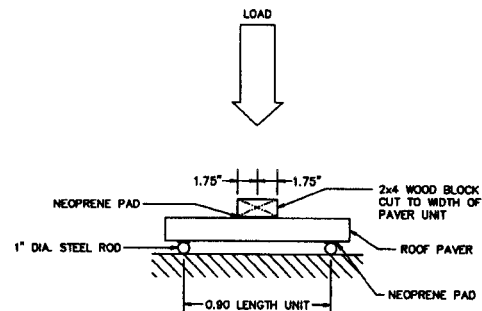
Flexural Strength Test Setup for Concrete Roof Pavers
